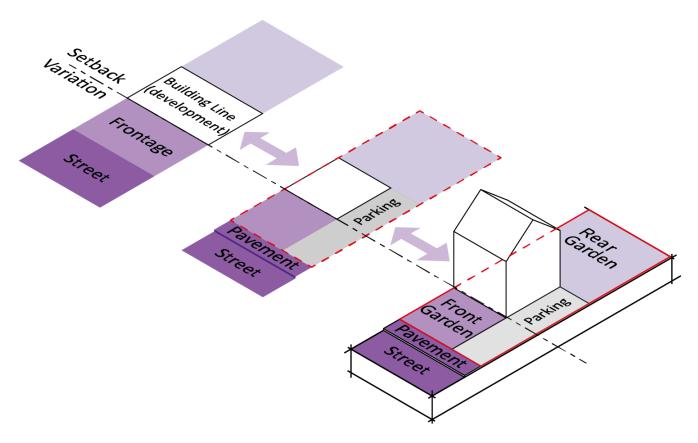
Individual plots are defined by their curtilage (plot boundaries). Their frontage should have direct access onto the street, have a varied setback considering street type and character, a clear building line, and private amenity to the rear or side of the building.
